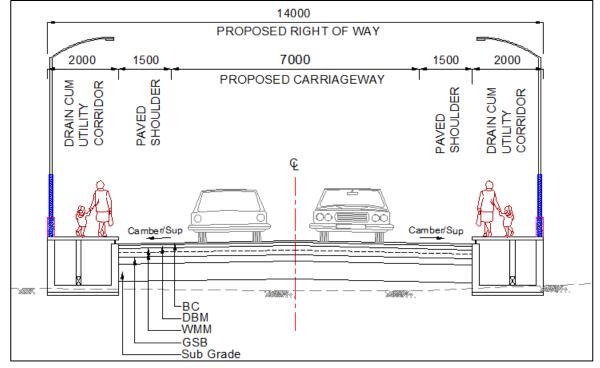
TCS-2: Typical Cross Section for 2 Lane in Greenfield Section
